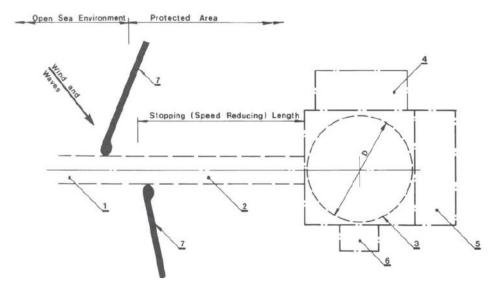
Harbour water area: 1) outer approach channel; 2) inner approach channel; 3) Turning basin; 4) Anchorage area; 5) Berthing area; 6) Special purpose area; 7) Breakwaters (Tsinker, 1997)
